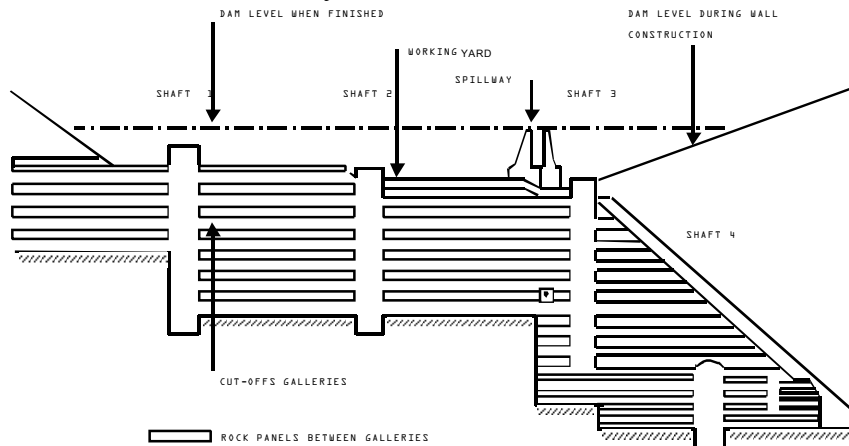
La Honda dam: Shafts and galleries used for cutoff for wall construction (Cross section)
